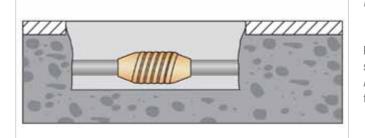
Installation of RAUTITAN system within concrete/screed floor with corrosion protection system
